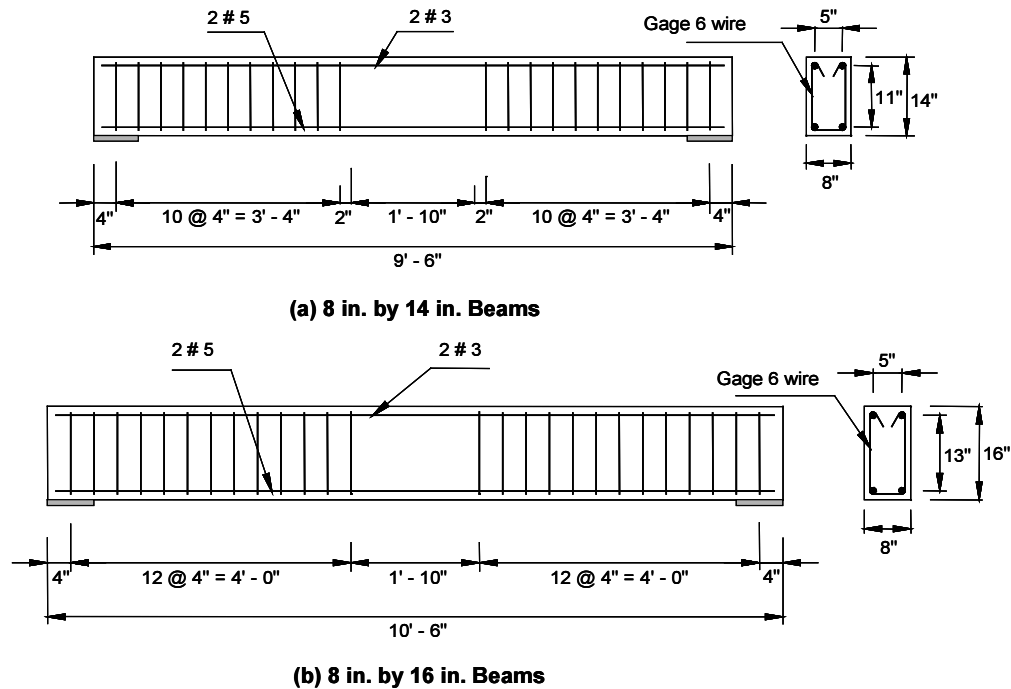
Geometry and Reinforcement of Laboratory Specimens
